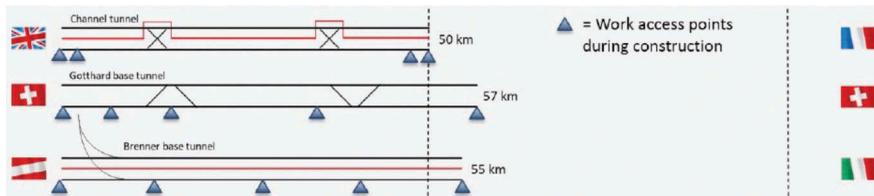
Systems layout of long tunnels in Europe with work access points during construction (FINEST LINK, 2018).
